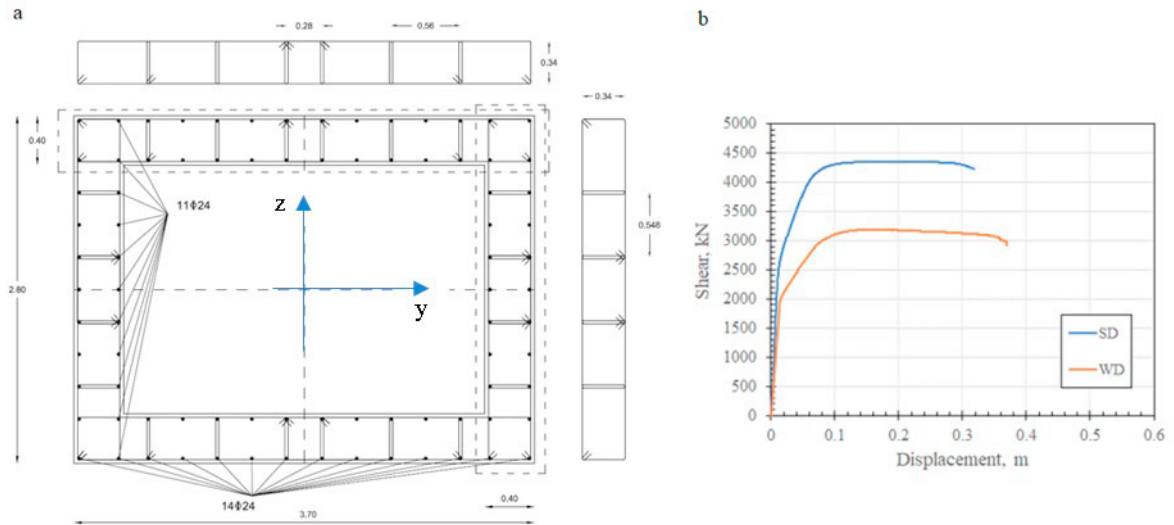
(a) Cross-section of the studied pier. Transverse reinforcement bars have 10 mm diameter and 200 mm spacing, uniform over the height, clear concrete cover is 30 mm and (b) pushover profiles for the undamaged analyses, Strong and Weak loading directions.
